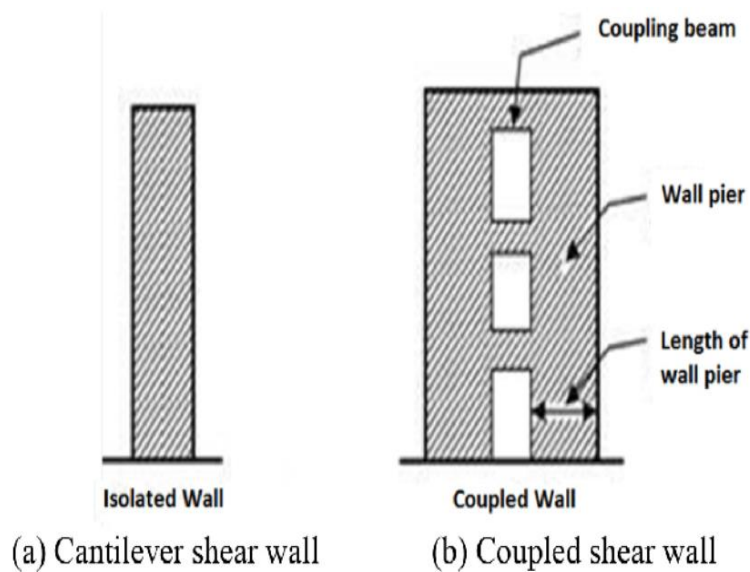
(A) ISOLATED WALL AND (B) COUPLED WALL
